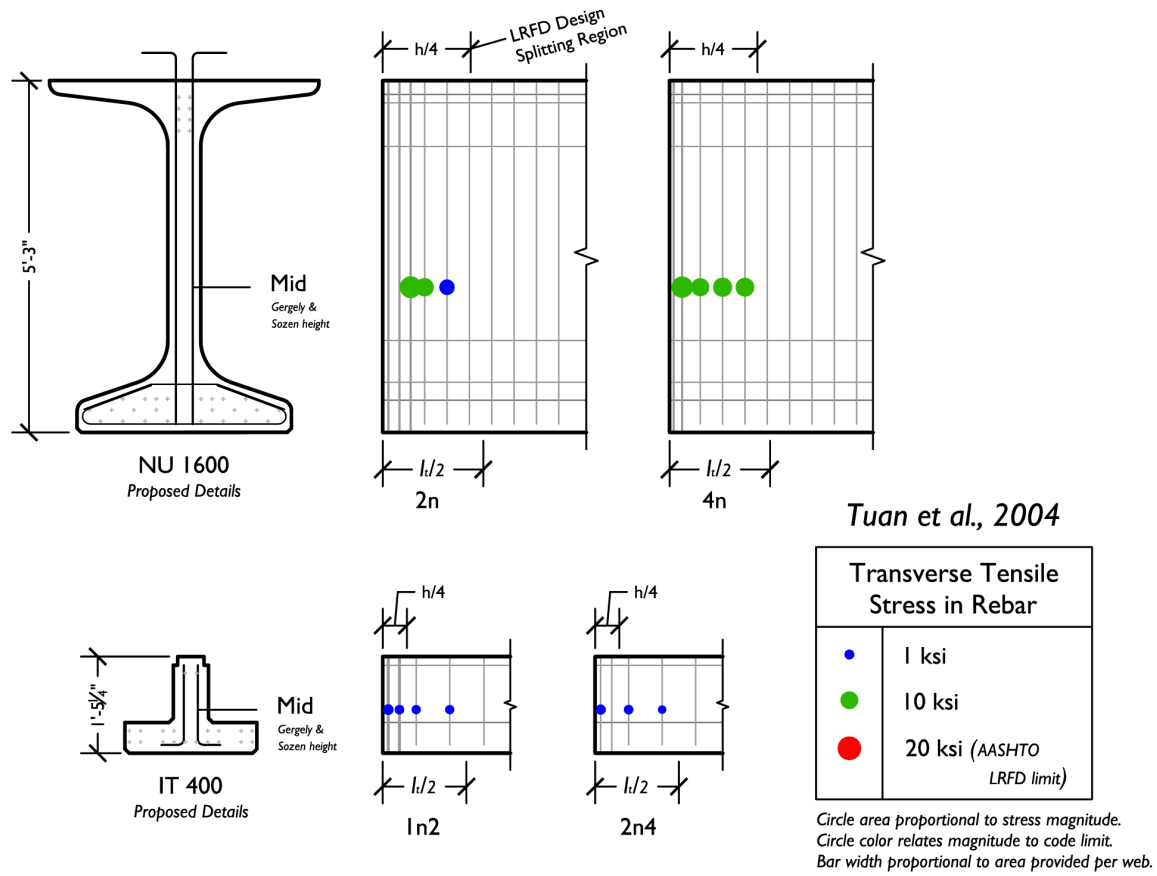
Nebraska bulb tees and inverted tees (NU and IT girders), proposed reinforcing details
